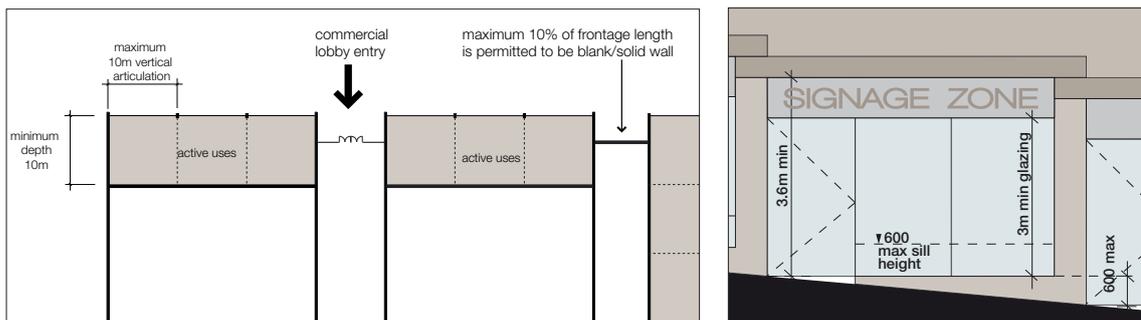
Active Frontages Plan Diagram and Active Frontages Elevation Diagram
